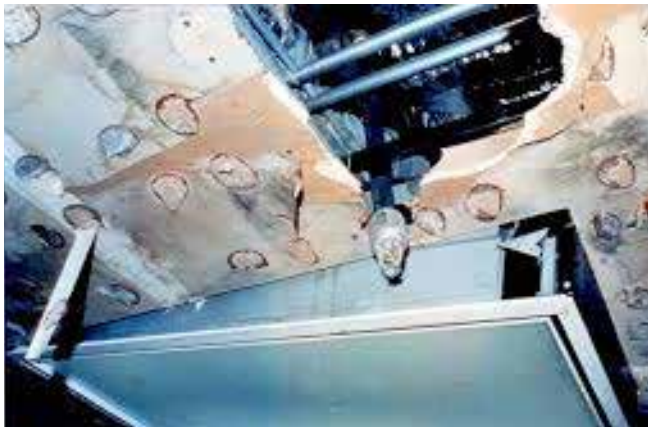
A hospital in Sylmar, California only suffered minor structural damage from the 1994 Northridge earthquake. However, a broken sprinkler pipe caused water damage to the hospital. This type of damage can force hospitals to temporarily shut down. At another facility, a damaged water tank on the roof leaked up to two feet of water at some locations. Photo: FEMA.
